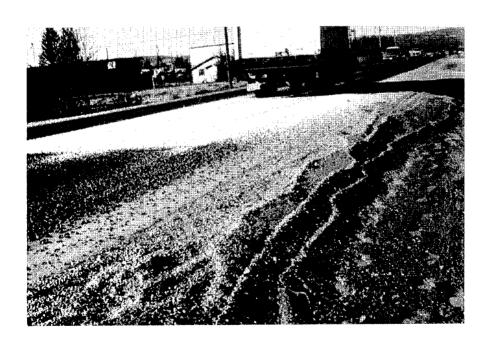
Intersection of test sections 3 and 4 on 27 August 1981.
